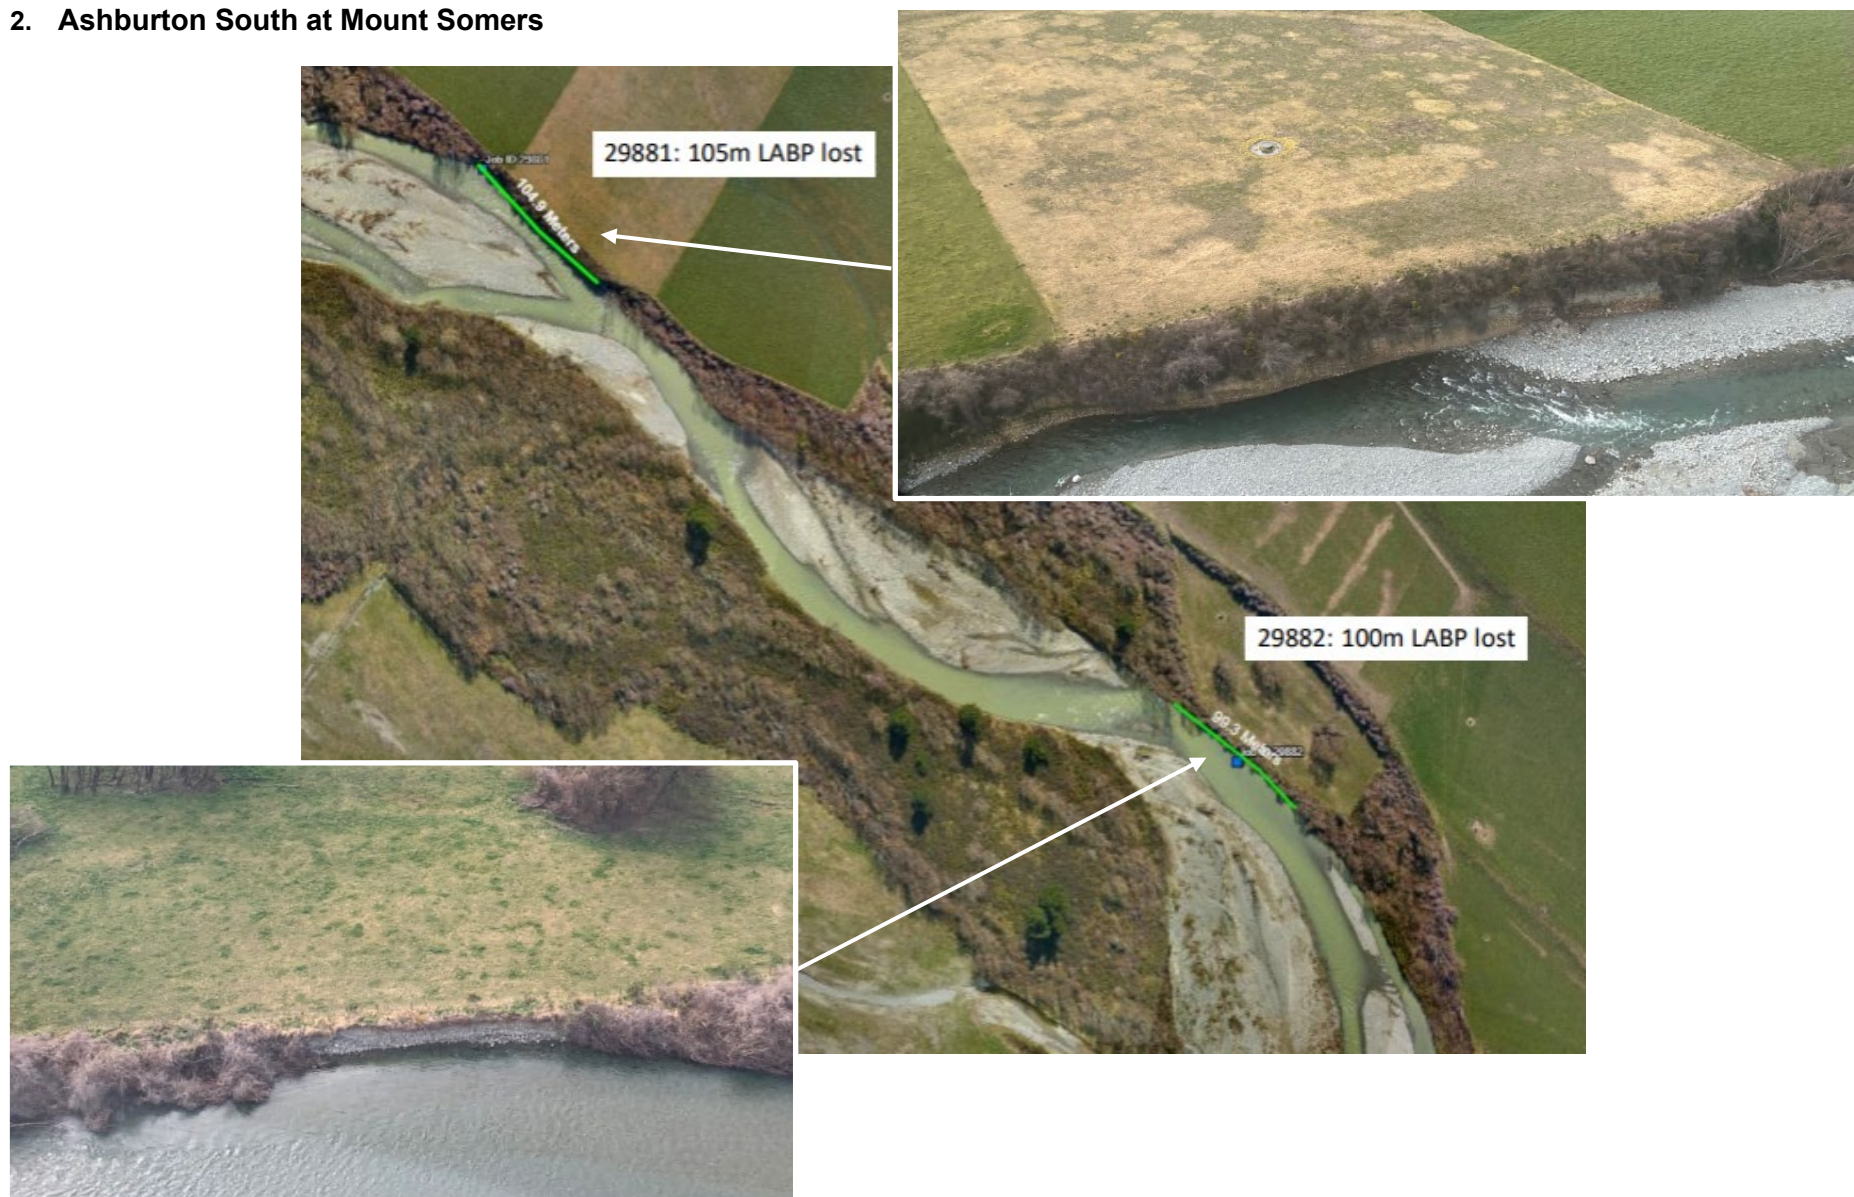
Ashburton South at Mount Somers, vertical banks requiring repair.
